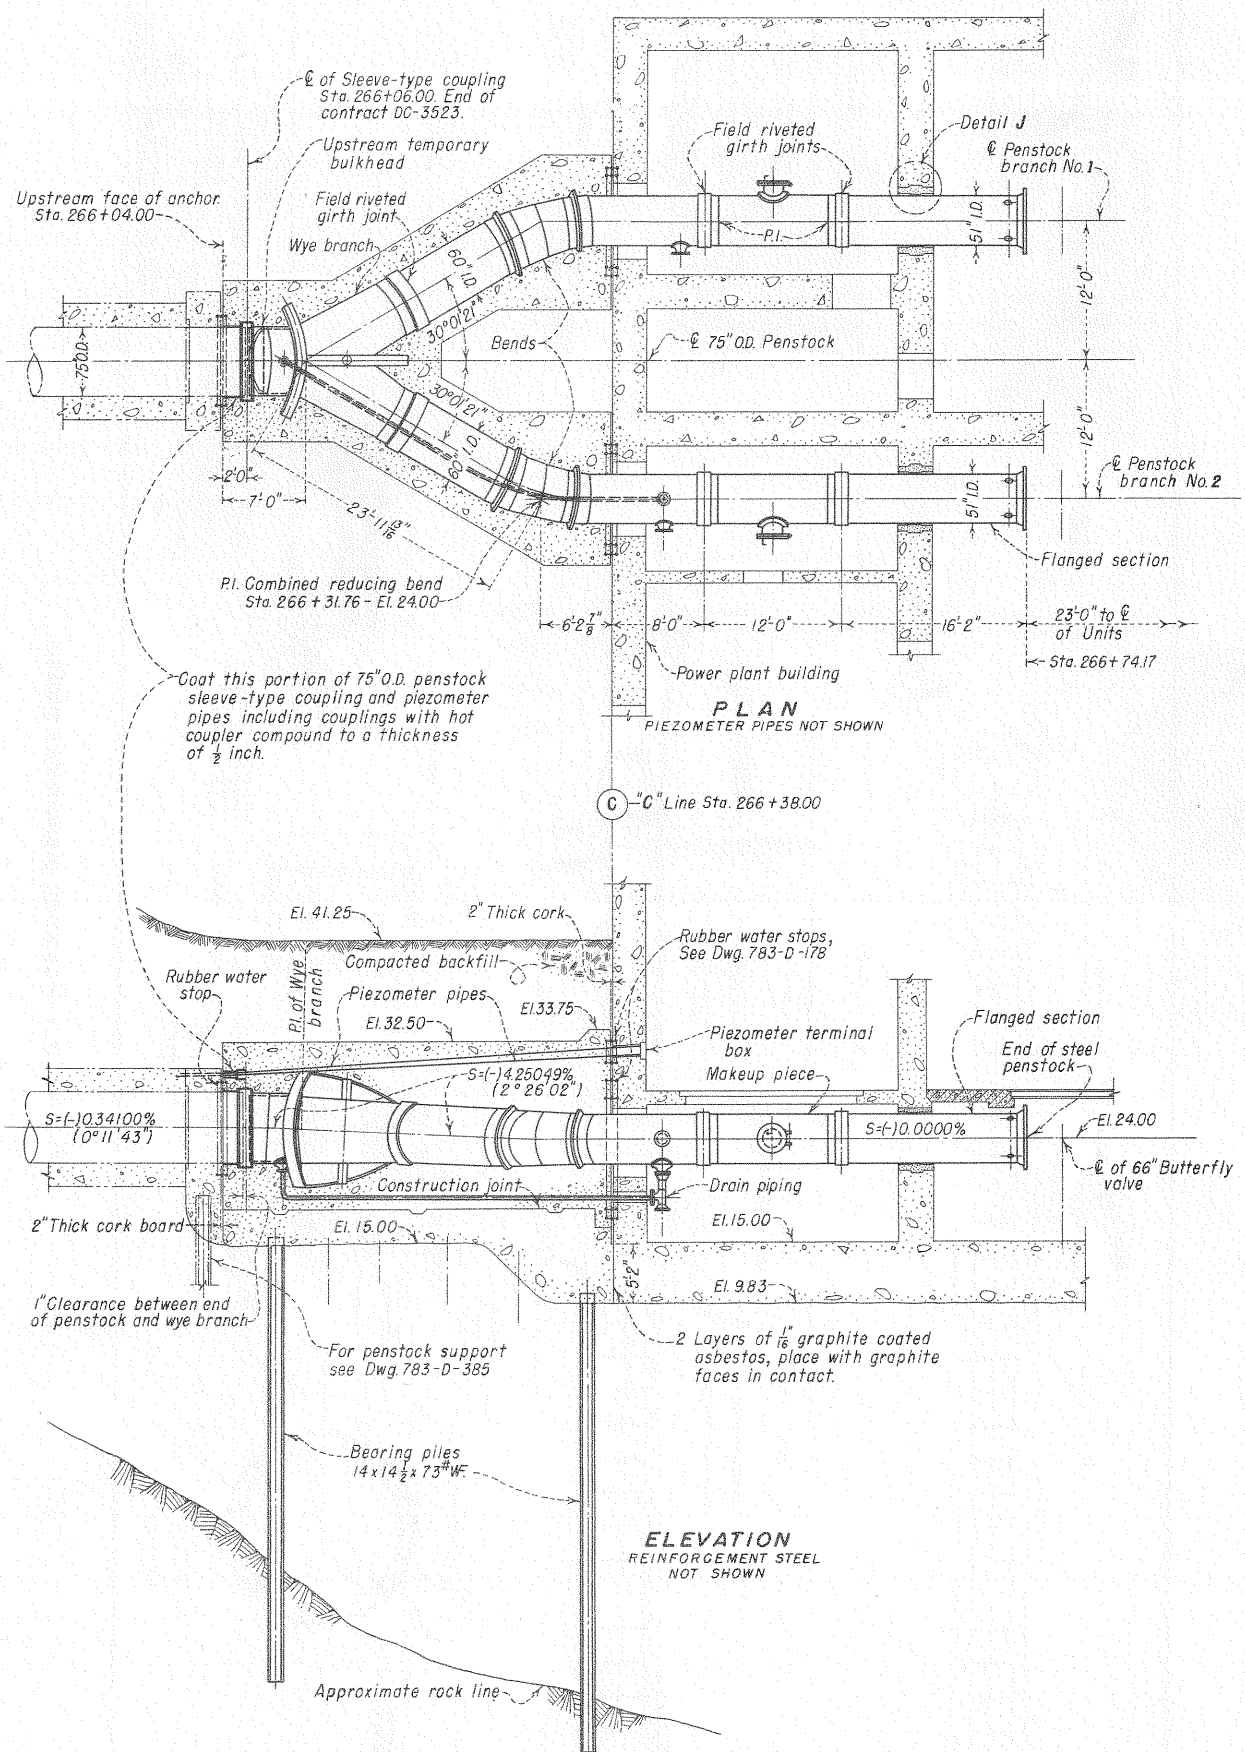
Plan and elevation of penstock wye-branch. From drawing 783-D-232.
